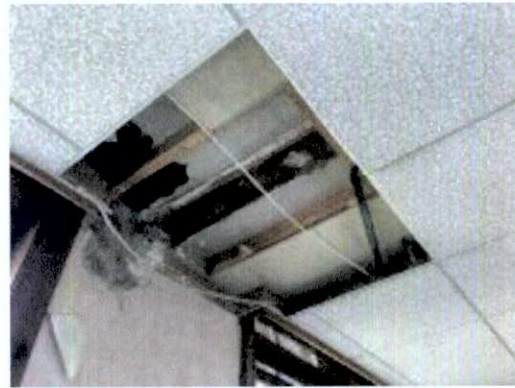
Multiple layers of past interventions Floor composition: floorboards on later timber joists, steel beams and 2 layers of later suspended ceilings.
